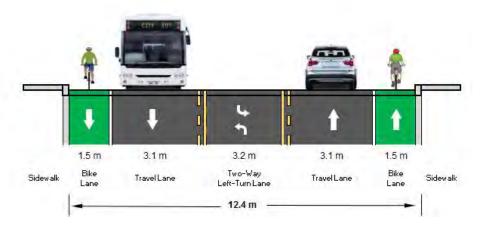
Proposed Road Diet Configuration between Great Northern Road and Pine Street (Section C and D)
